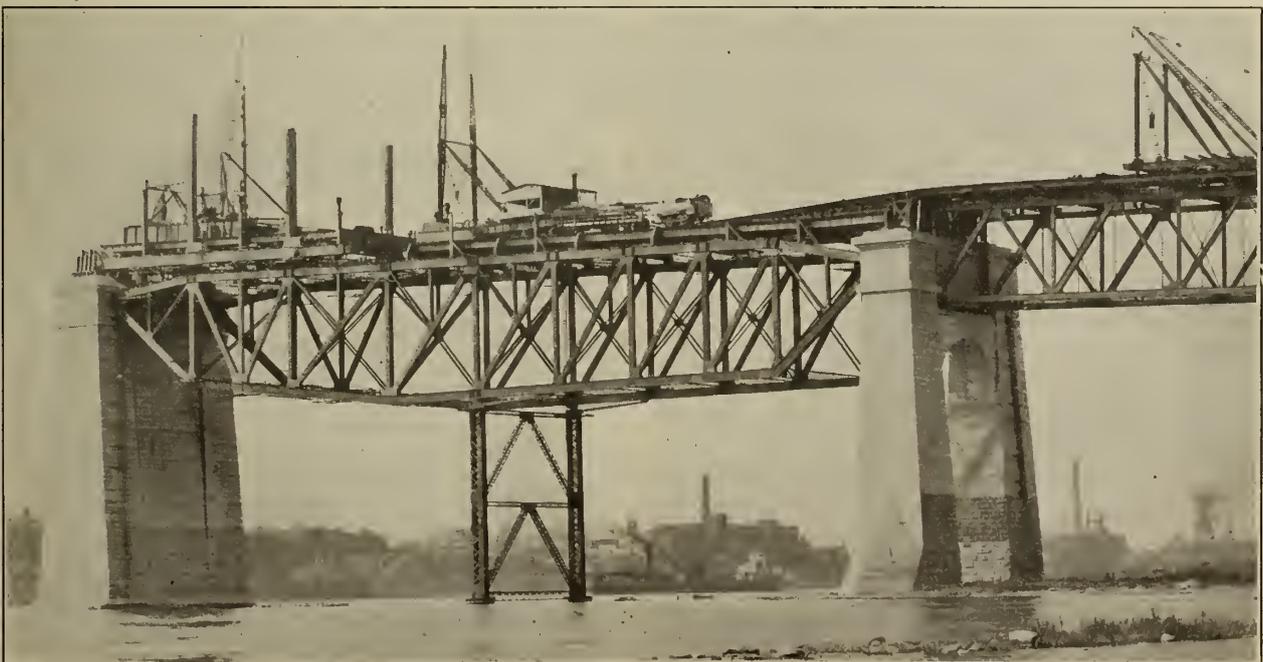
Main Span, South Side—Erecting Bottom Chords and Floor System of Anchor Arm—Second Stage. Erection also commenced on Traveller No. 4.
